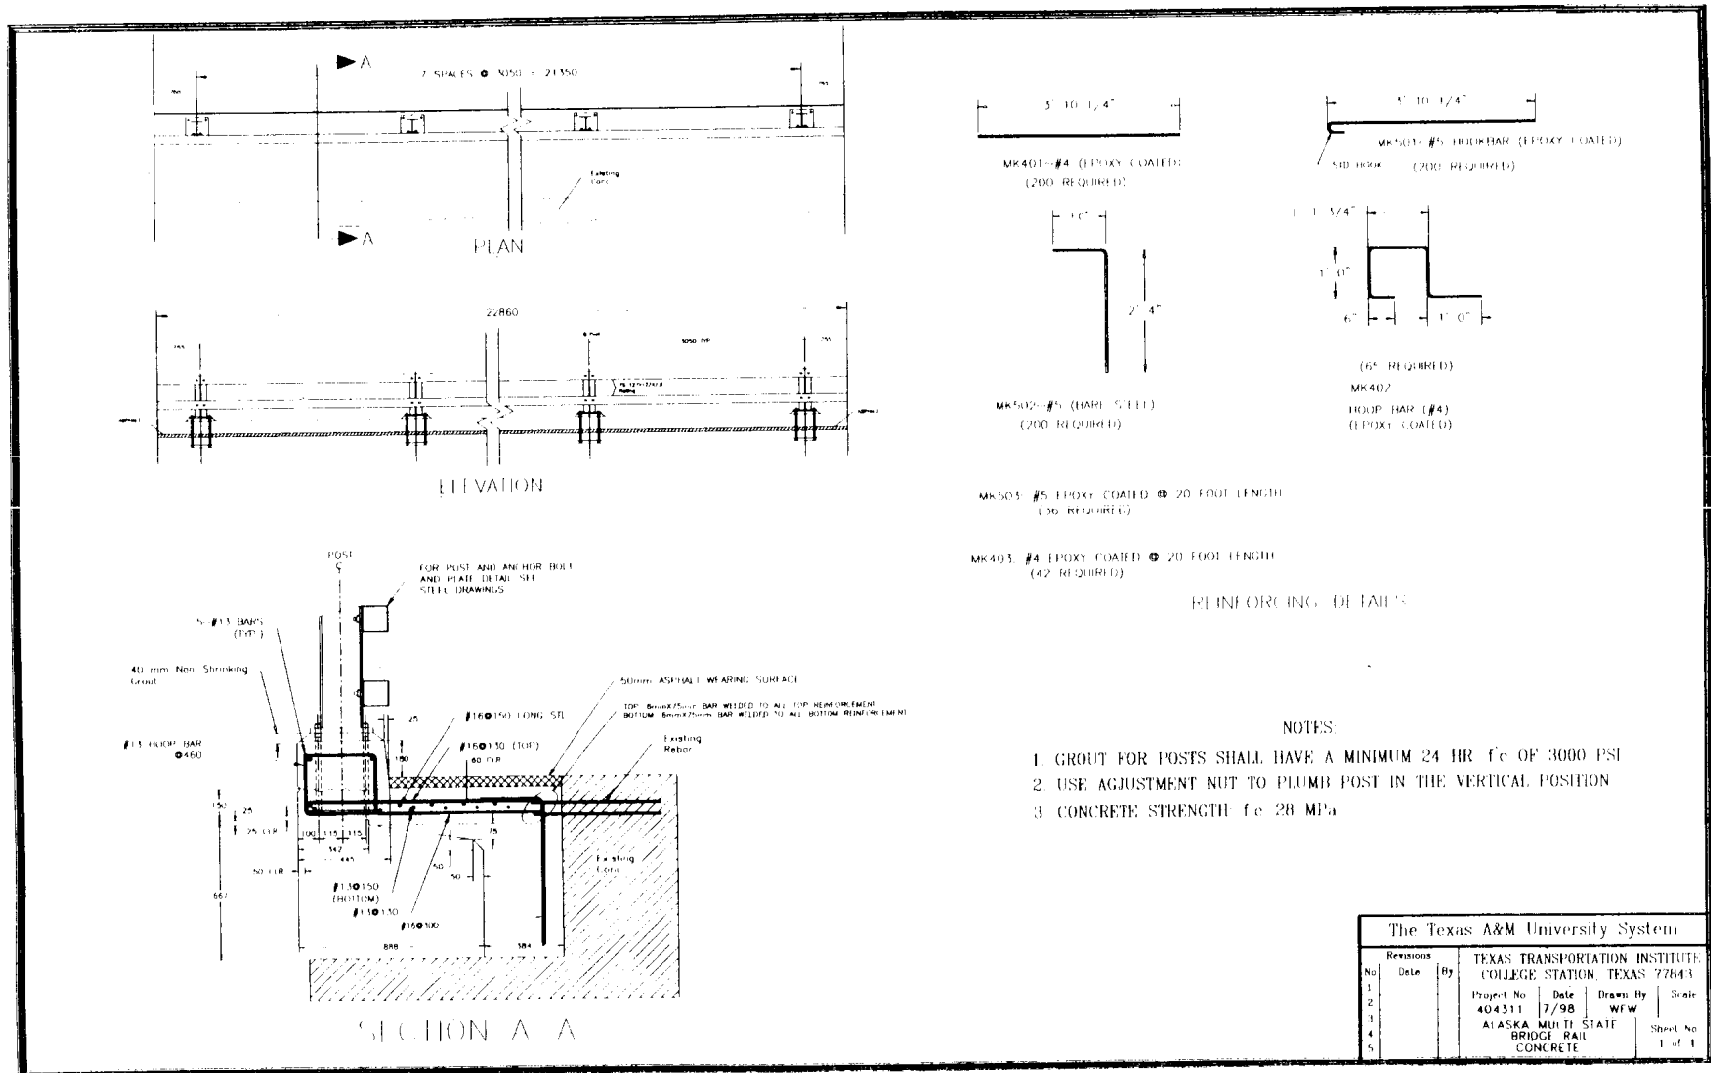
Details of the Alaska Multi-State Bridge Railing mounted on the curb (concrete).
